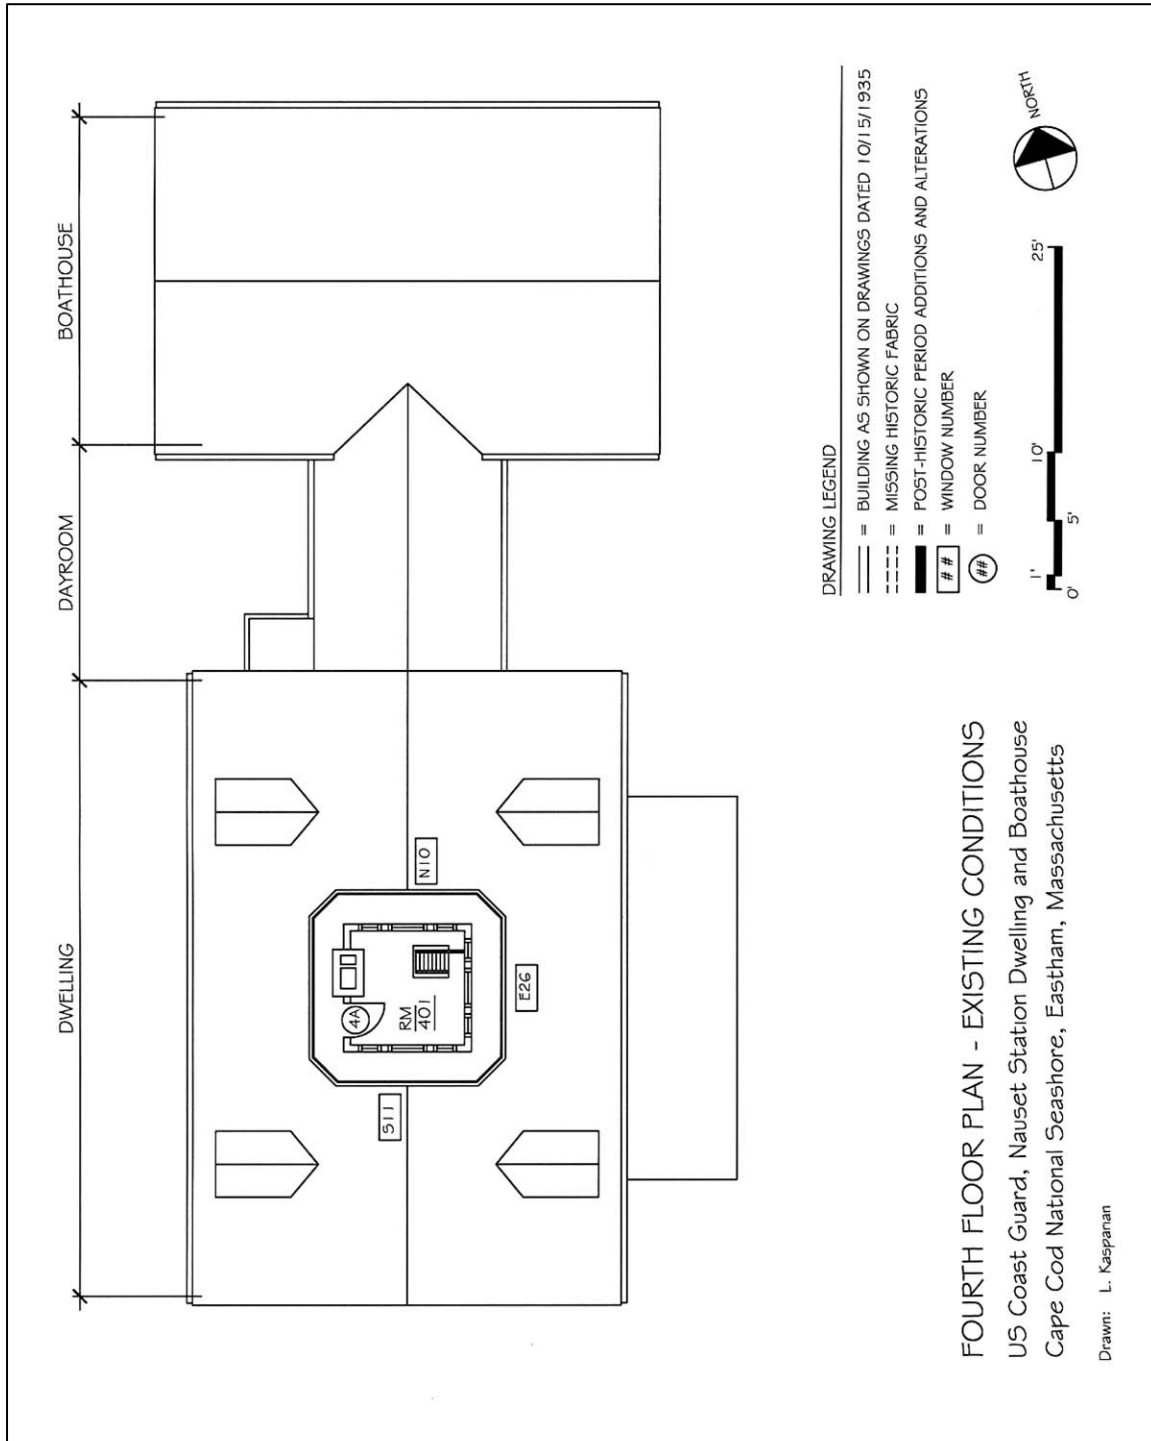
Fourth (Watch Room) Floor Plan – Existing Conditions.
